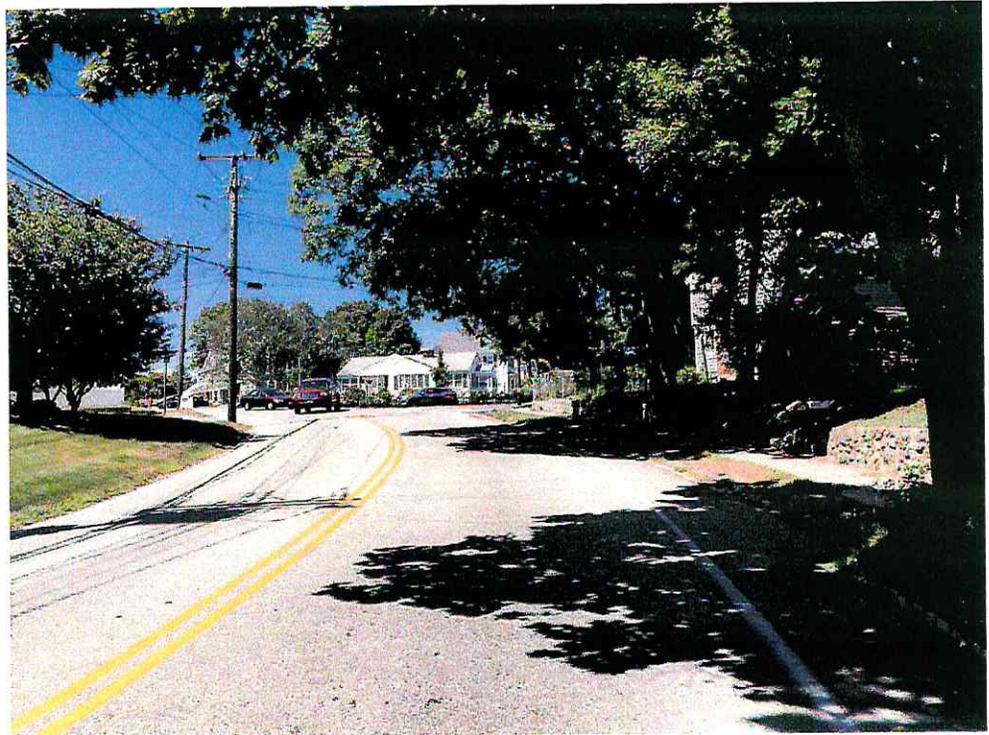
Location n – Cross St. looking west. 90' east of Holton St.
